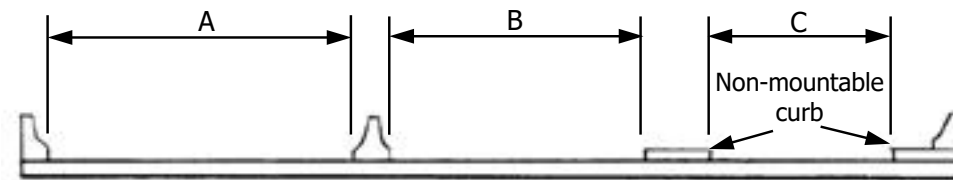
Cross-section view of a bridge deck with non-mountable curb and median barrier.
